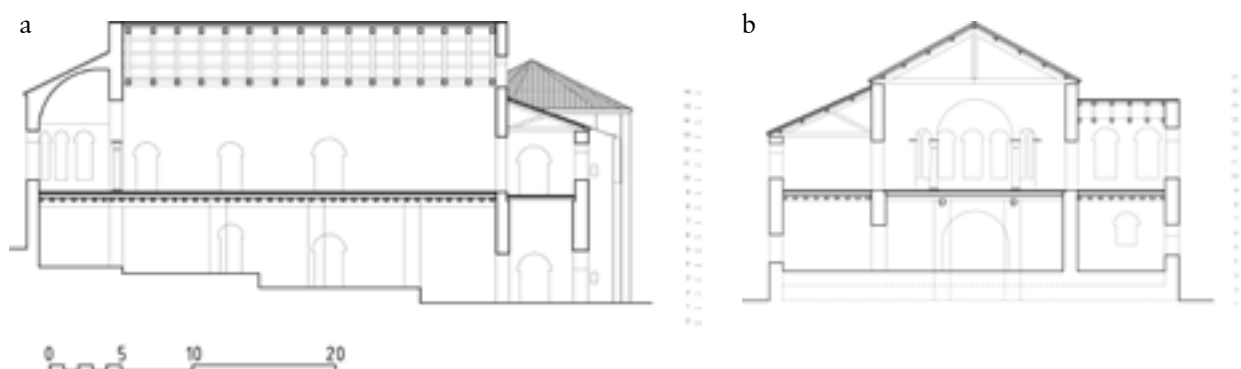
Longitudinal and transverse palace section, proposed ideal reconstruction, Ž. Peković, 2010
